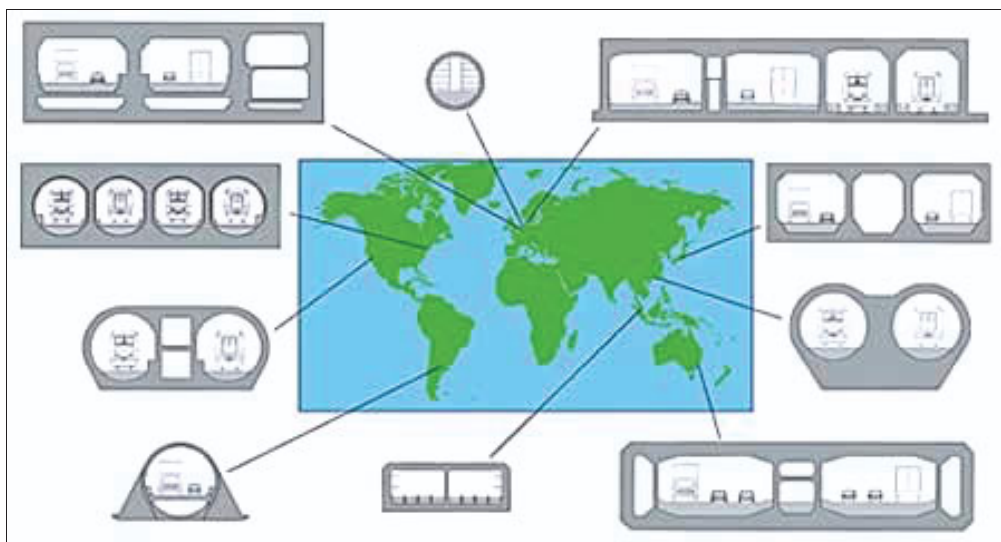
Different cross-sections for immersed tunnels worldwide [25]
